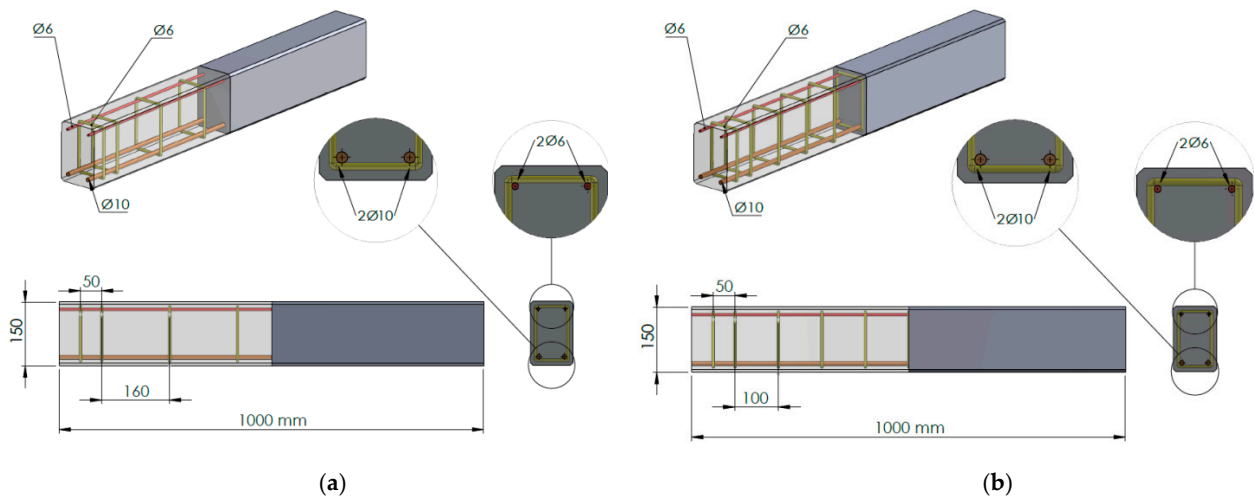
Details of the beams. (a) Shear beams; (b) Bending beams.
